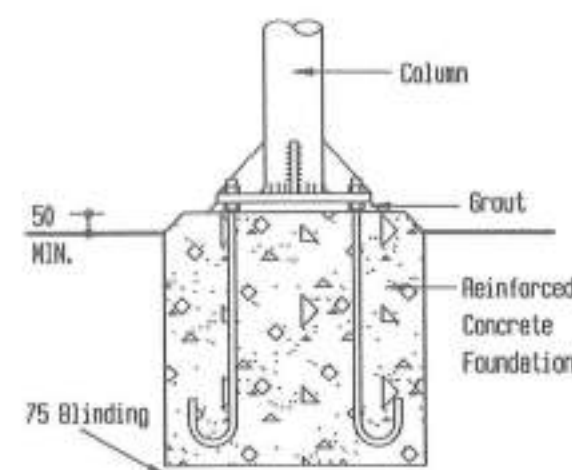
Mounting Detail for Heavy Box Section Support with Fixed Base plate
